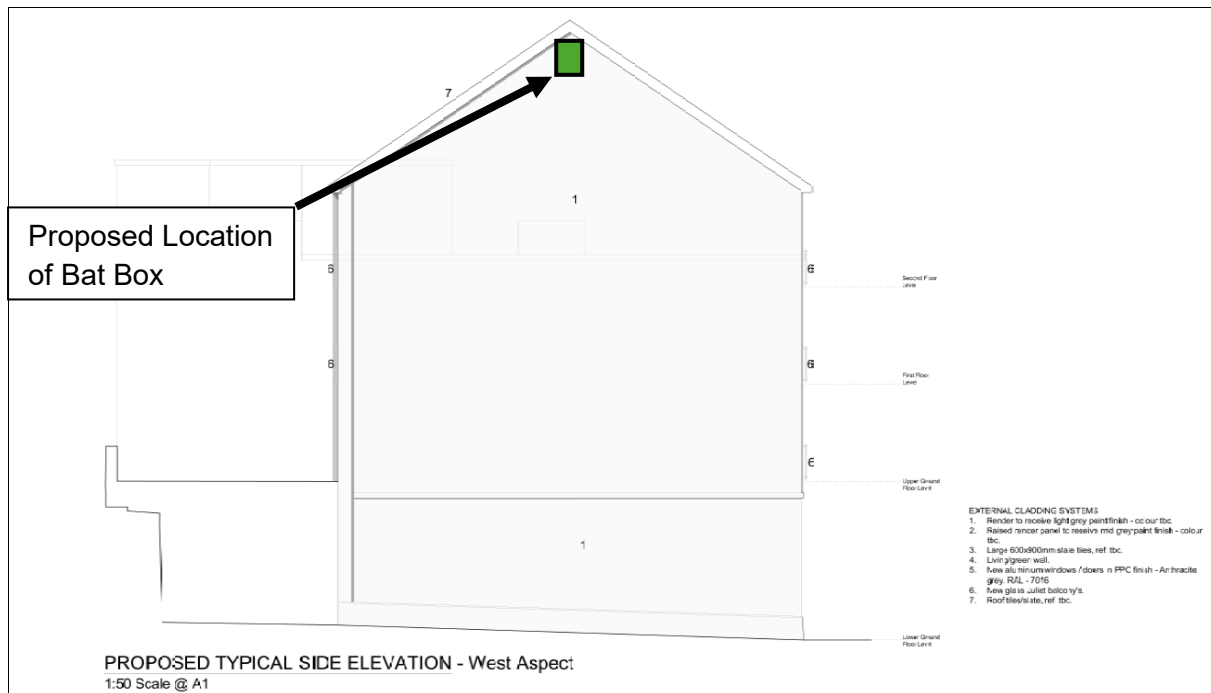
Location of Proposed Bat Box to Enhance Biodiversity at the Site
